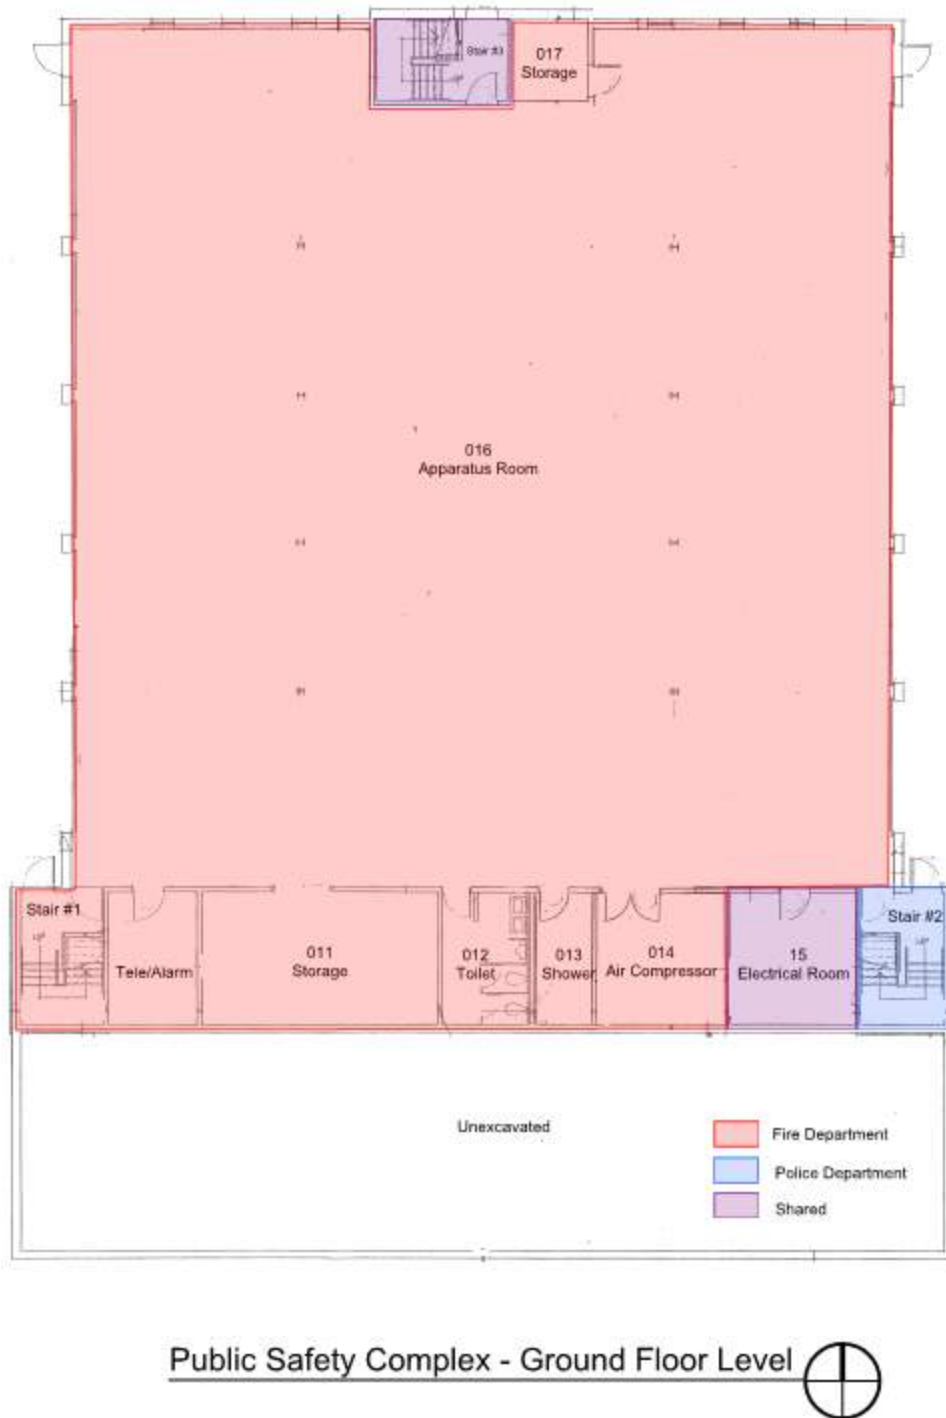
The Ground Floor plan consists of the two-story Apparatus Bay and support facilities dedicated to Fire Department use. The bays can be accessed from either side, or used as drive thru bays although the double vehicle depth is not conducive to moving vehicles quickly.
